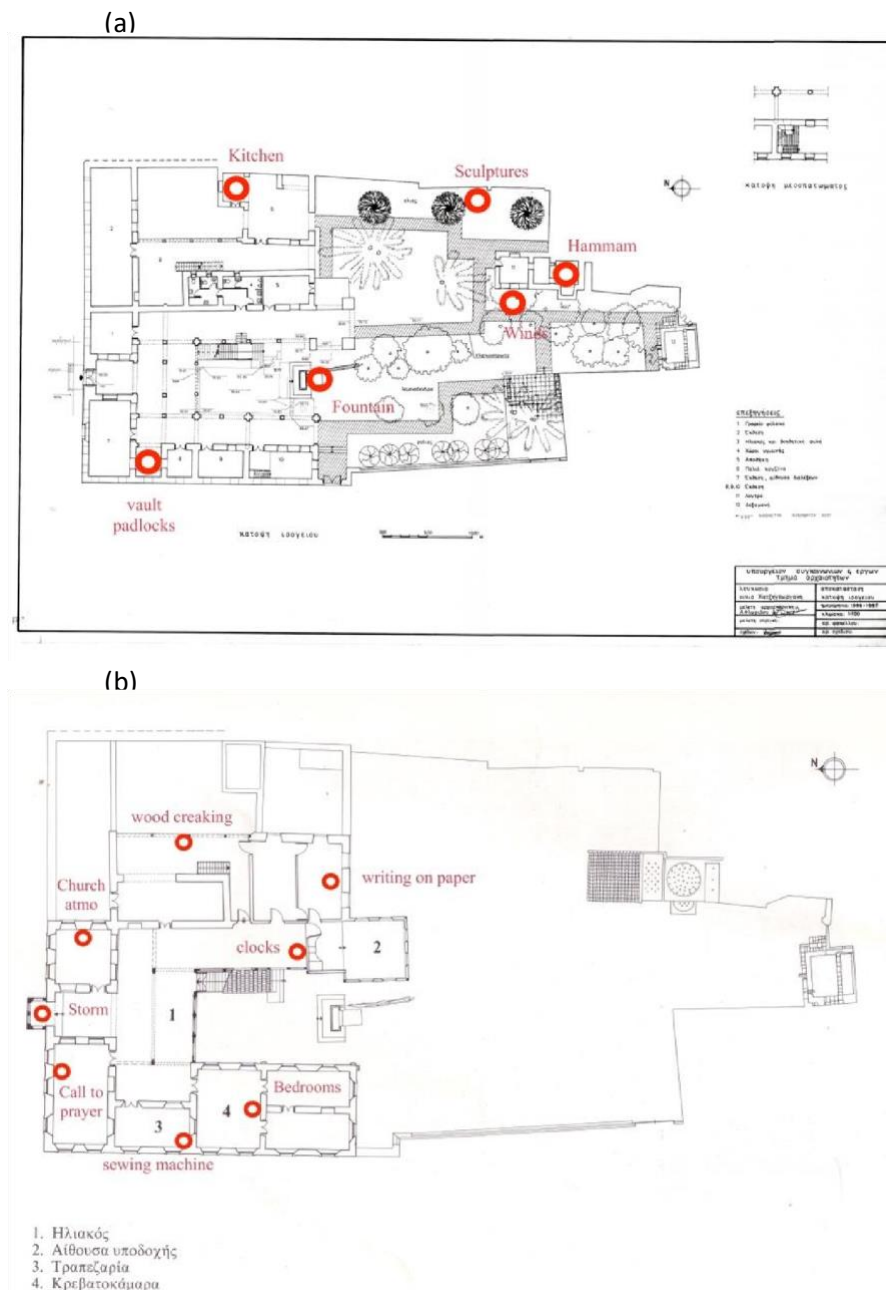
The layout of The House of Hadjigeorgakis Kornesios and all the locations where stations were placed on (a) the ground floor and (b) the upper floor.
